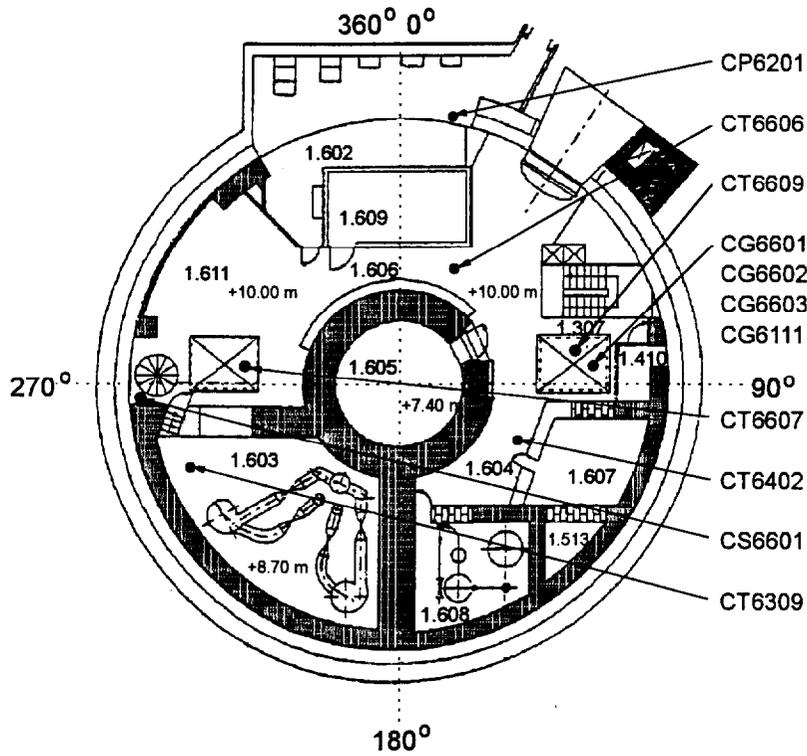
Level 1.600 at the +12.0 m Elevation for T51.1
